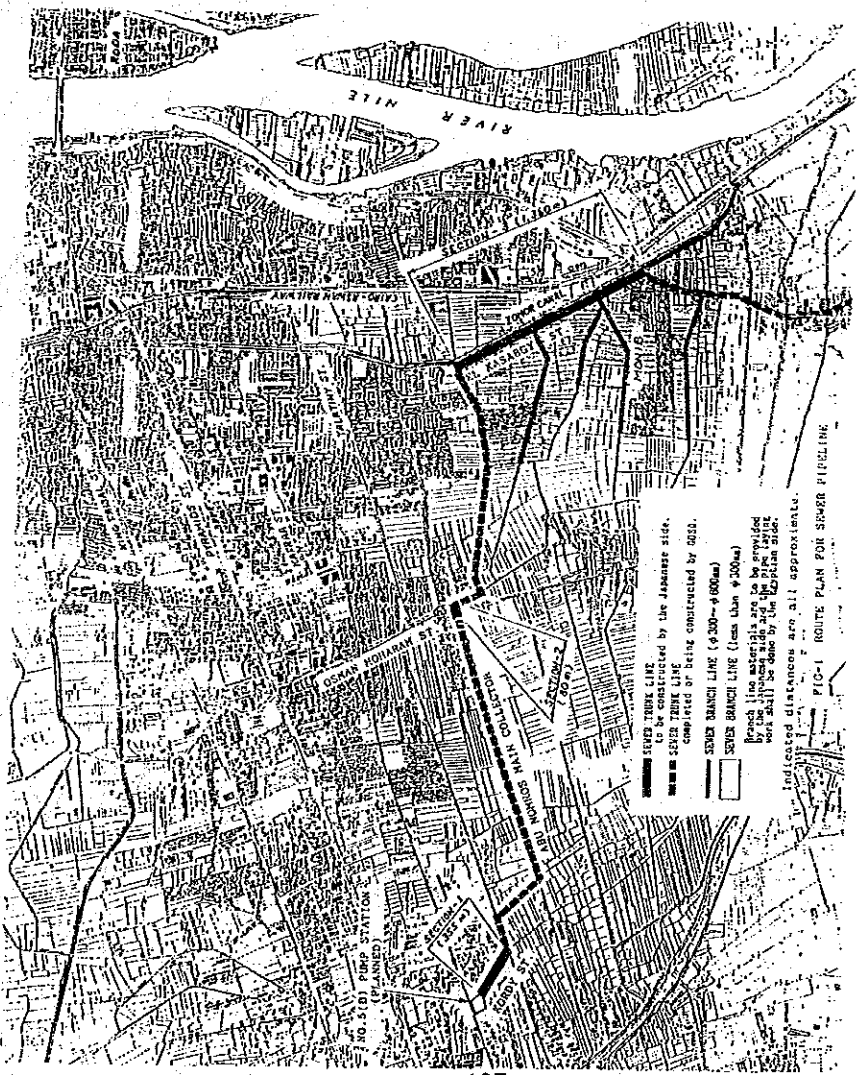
ROUTE PLAN FOR SEWER PIPELINE
